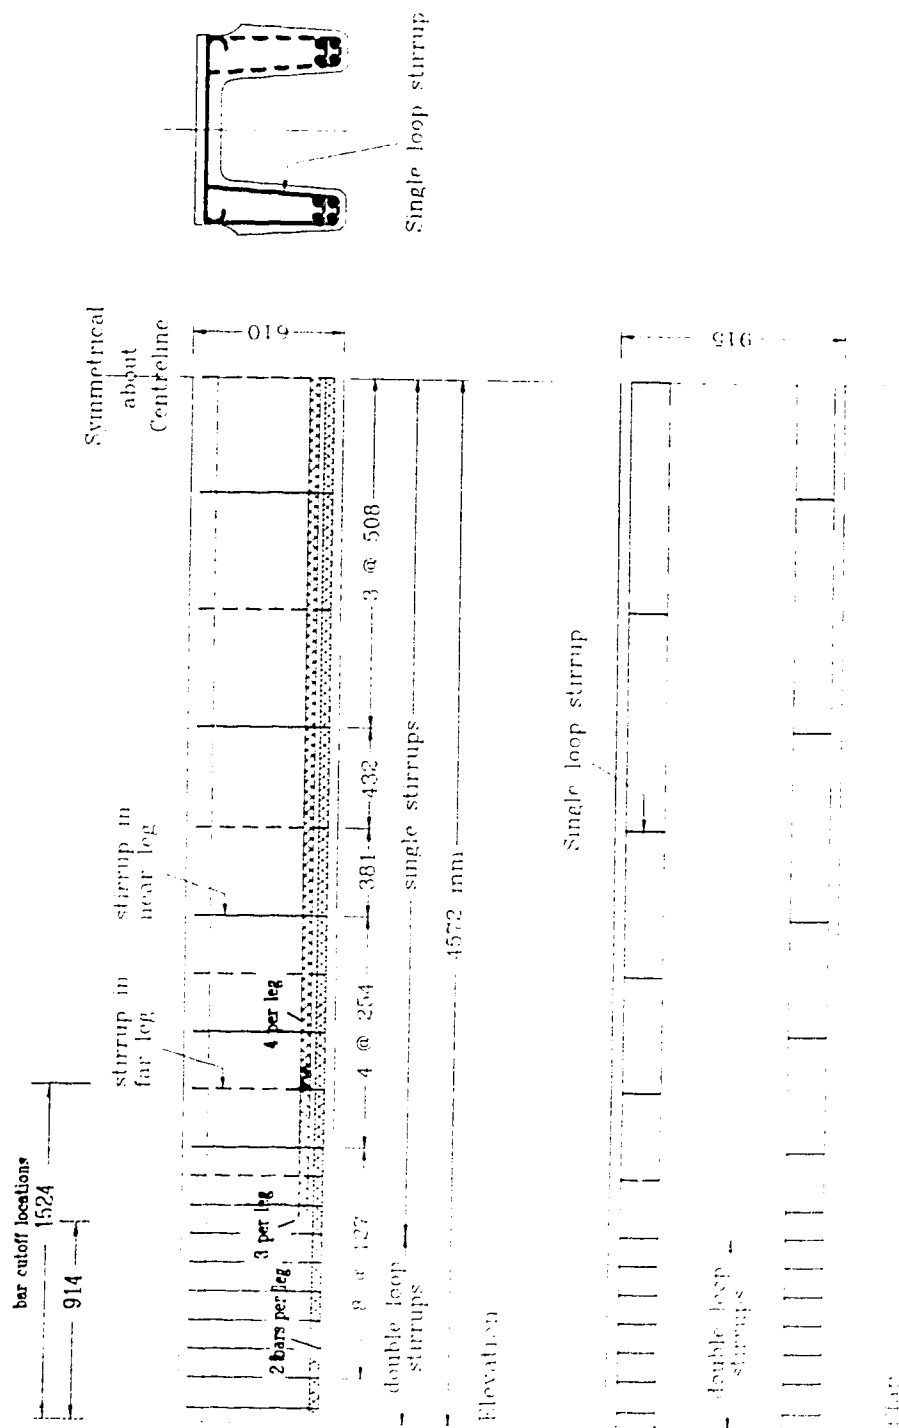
Longitudinal details of Type 'E' girder (Designed)
